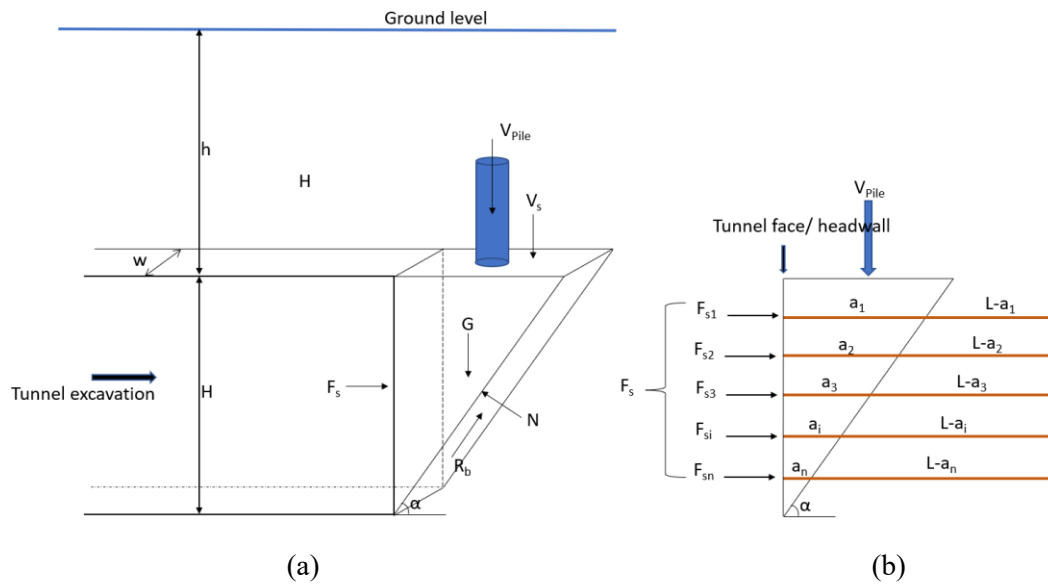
(a) Headwall failure mechanism; (b) rock bolt support force  $F_s$  distribution on tunnel headwall.
